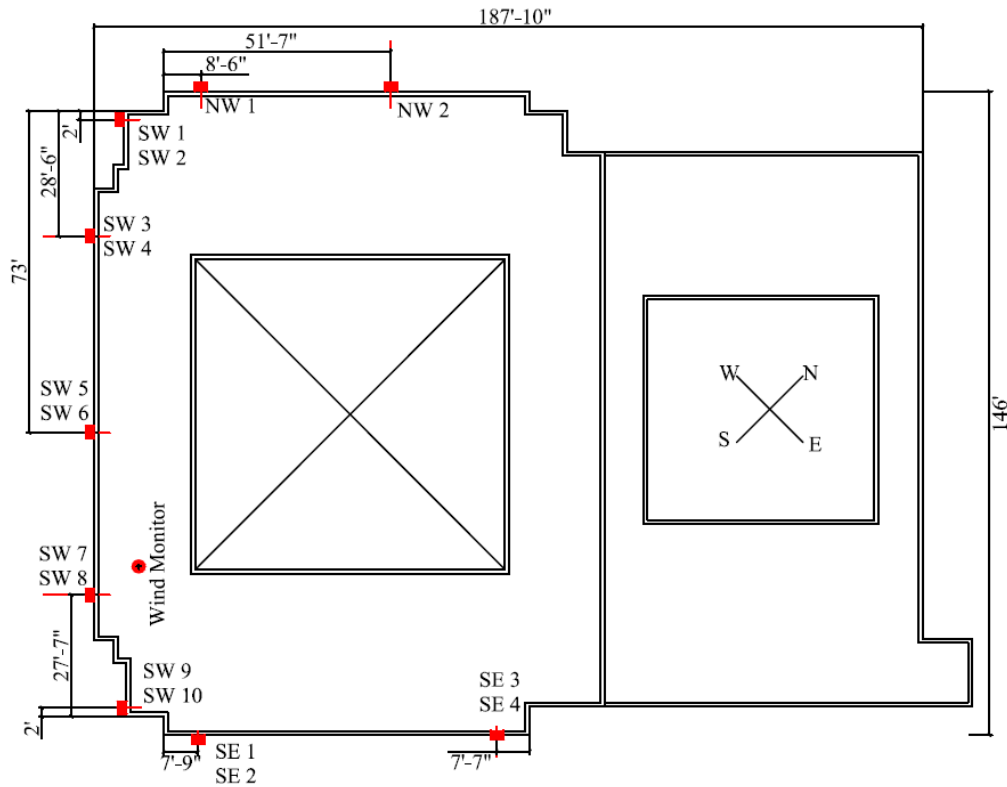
Plan view of HB Building with driving rain gauge locations
